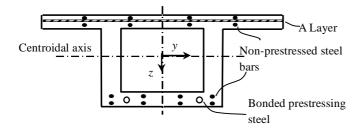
Typical cross sections and simplified arrangement of steels of a bridge deck
